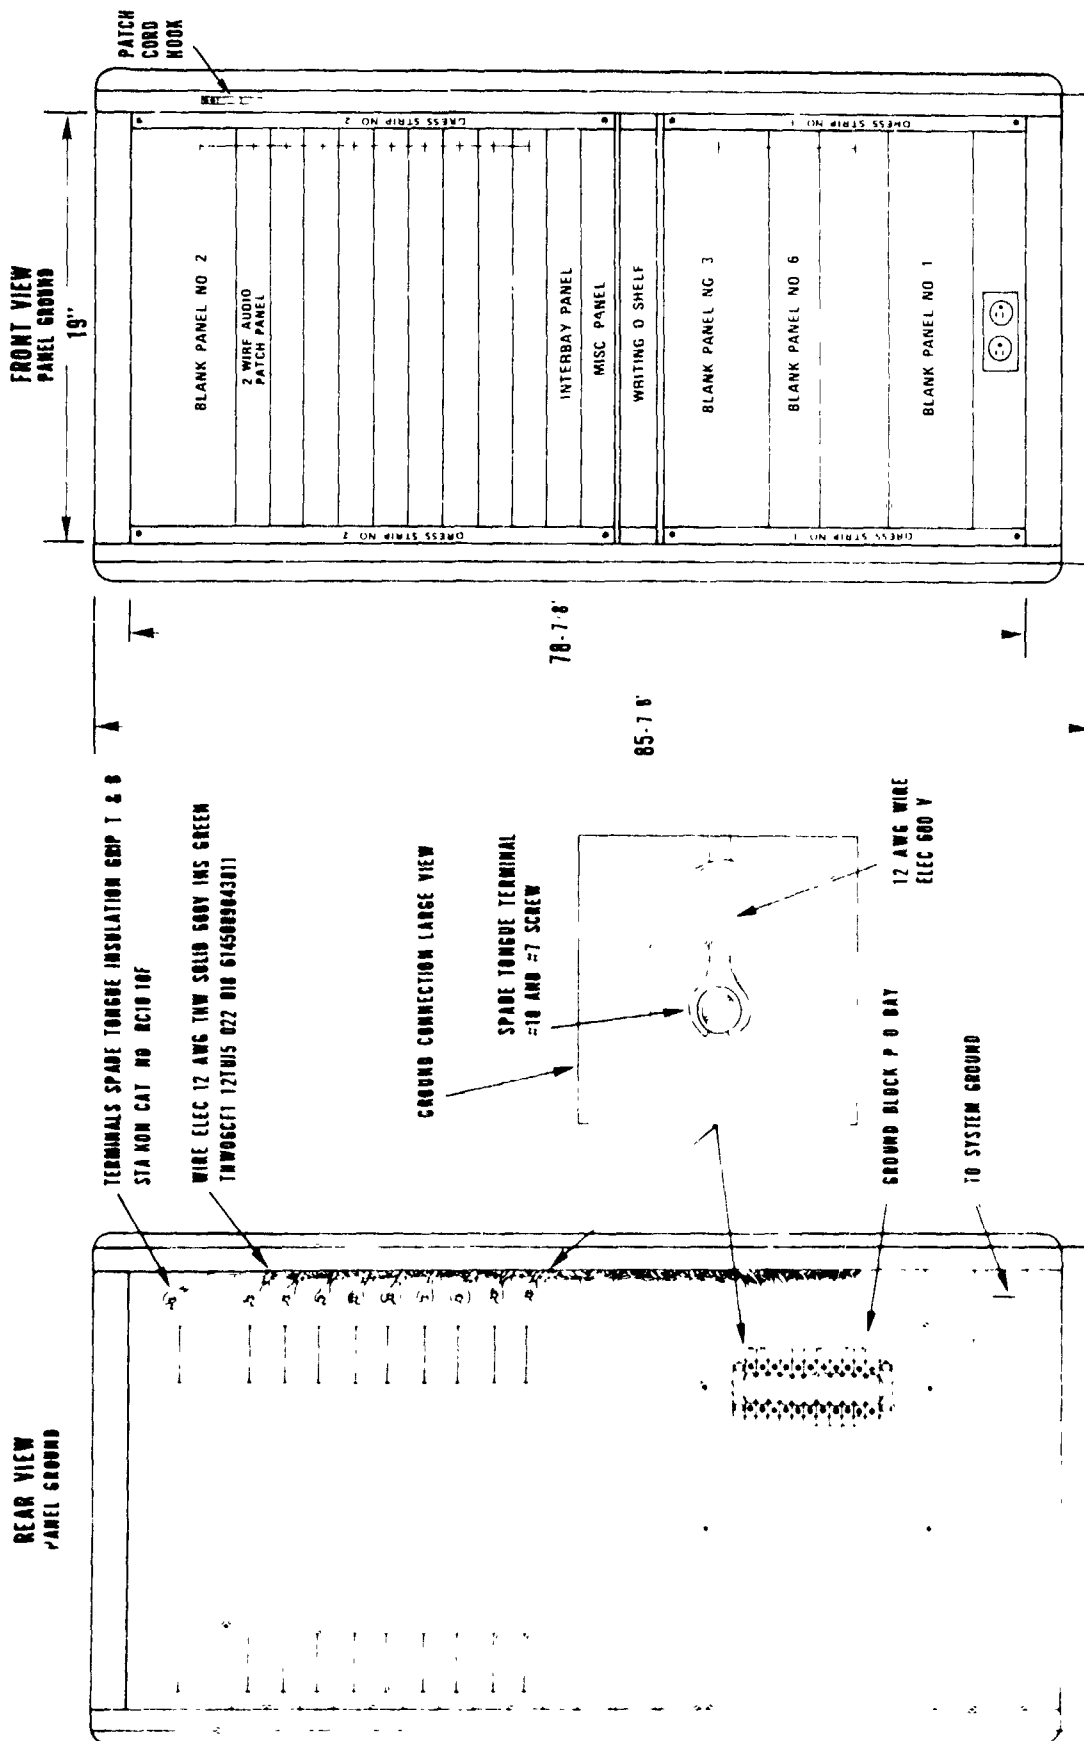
PATCH PANEL GROUNDING DETAIL
